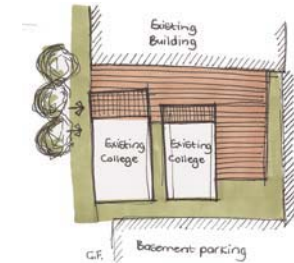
Ground floor plan of proposed Industrial Design Centre
